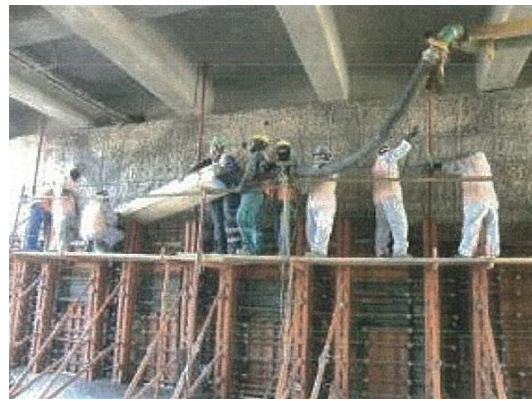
Repairing of abutment: placing of new concrete, 1st phase
